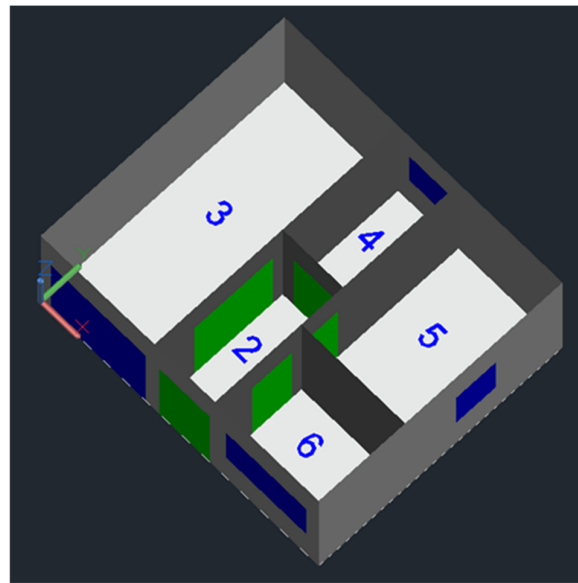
Numbering of spaces located on the ground floor of the residential building.
